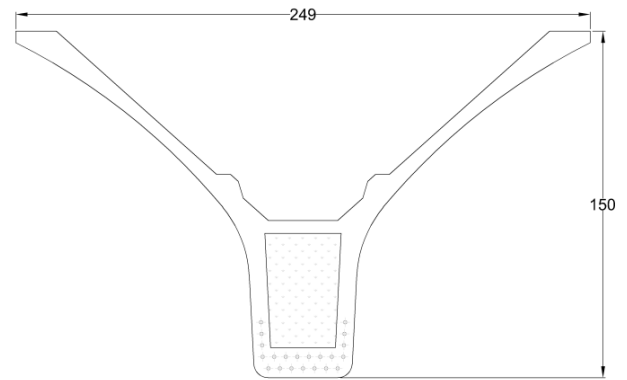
Cross-section of the BigOndal roof element – measures in cm / Sezione corrente del tegolo BigOndal oggetto di studio – misure in cm.
